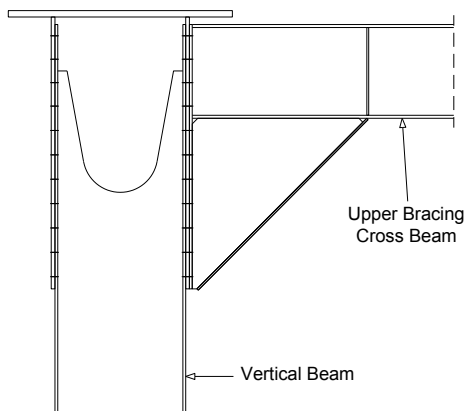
Side view of upper bracing cross beams with variable end cross sections
